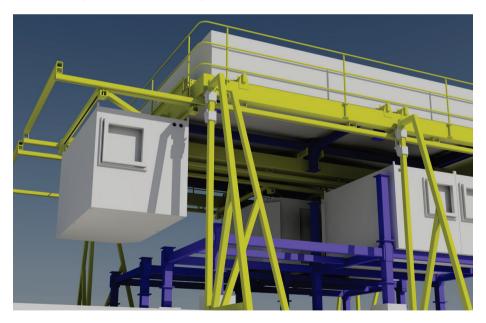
Assembling of the floor below [Routine 2: R2H]
